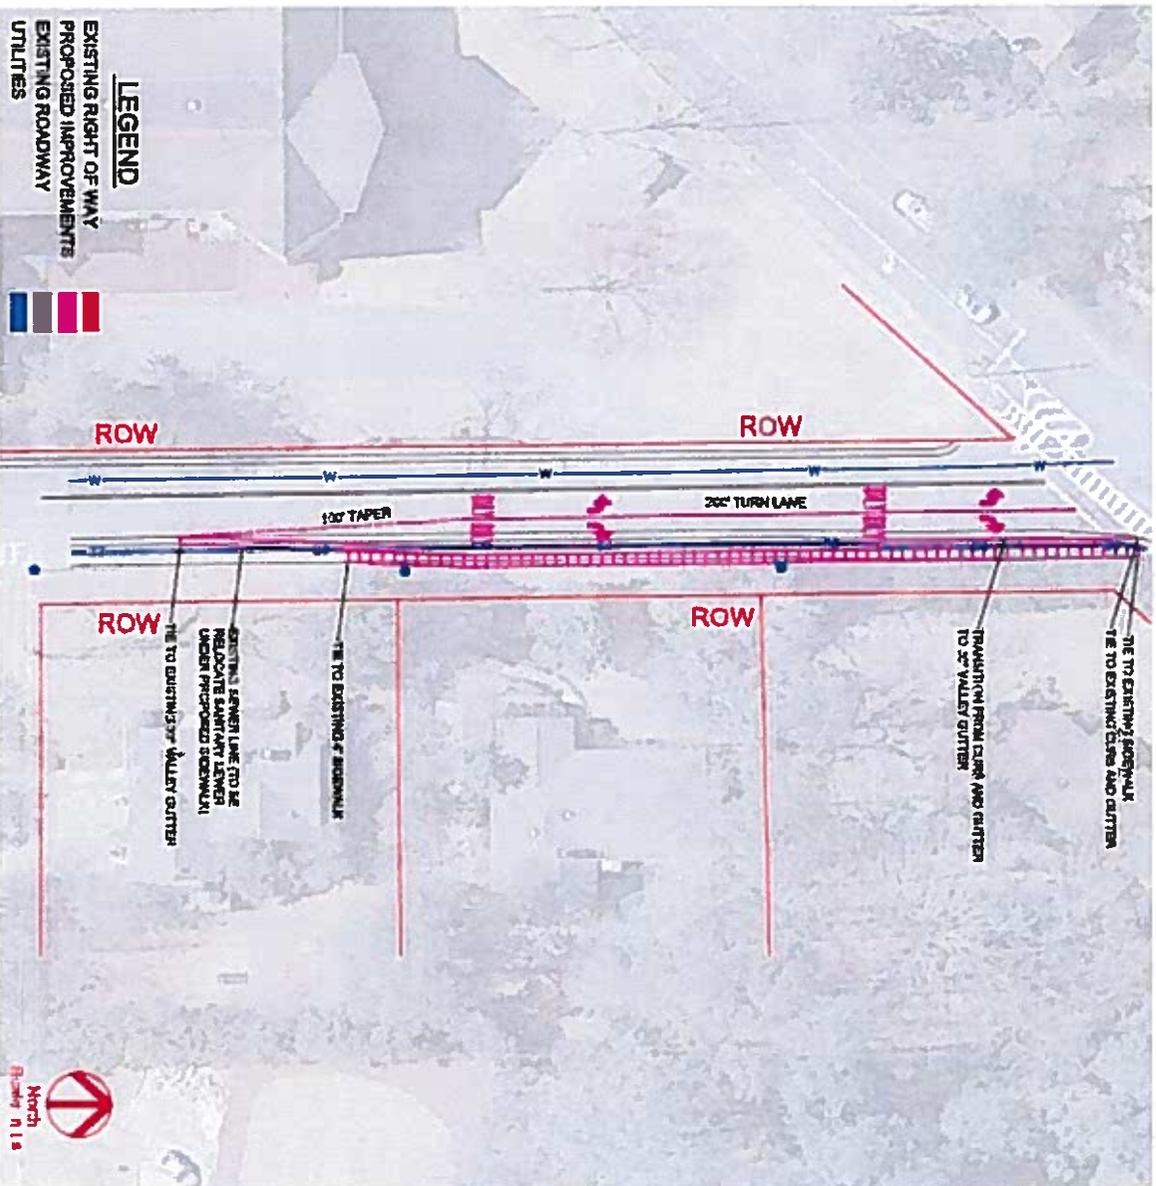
Preliminary Design of Right Turn Lane on Overbrook Road
